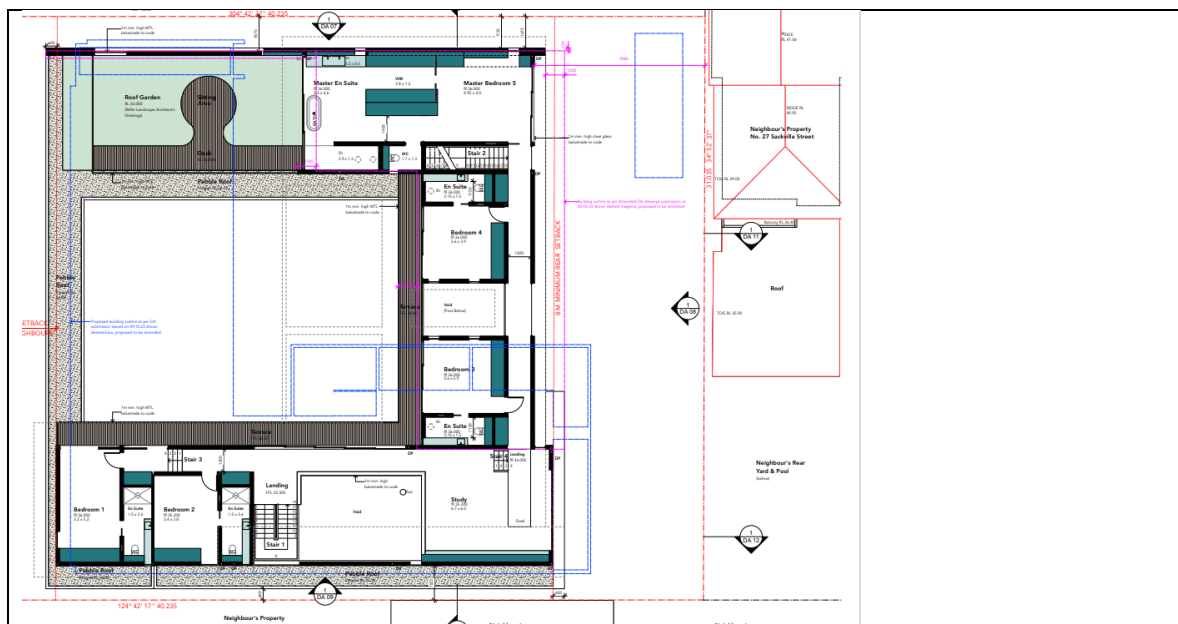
First floor plan - 3-7 Bona Vista Avenue
